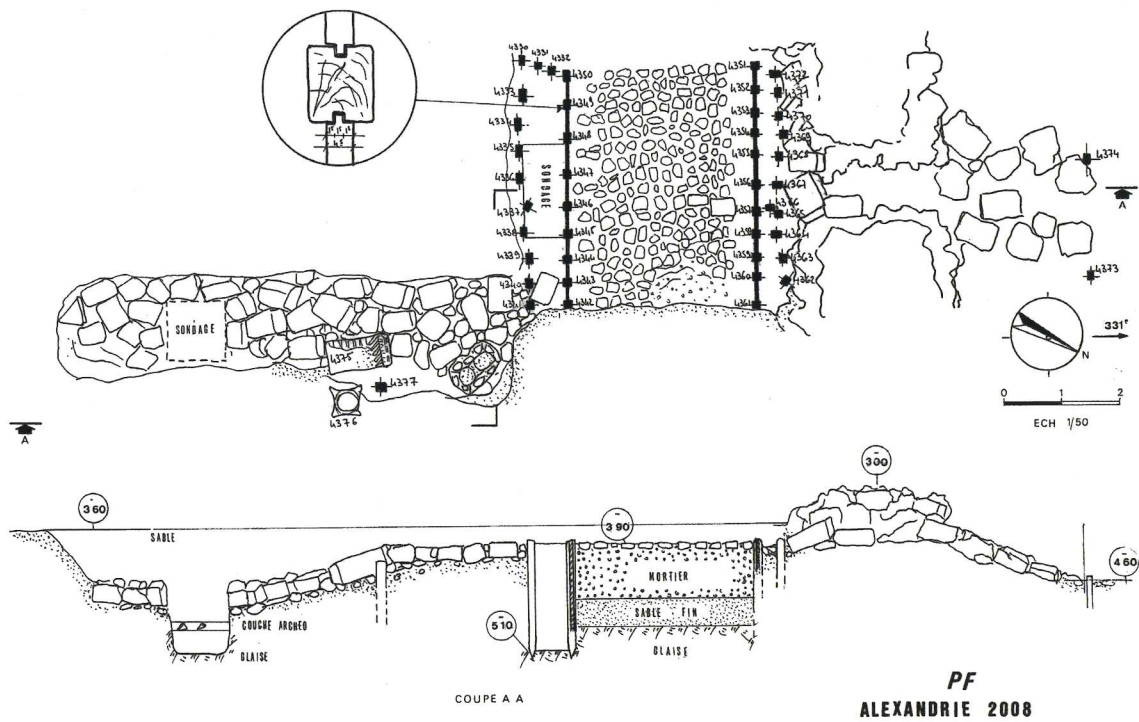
Plan and section of the port structures assembled from piles and wood planks that support a structure made of limestone blocks, PF sector, north-eastern part of the *Poseidium* peninsula. (Drawing: Patrice Sandrin © Franck Goddio/Hilti Foundation.)
